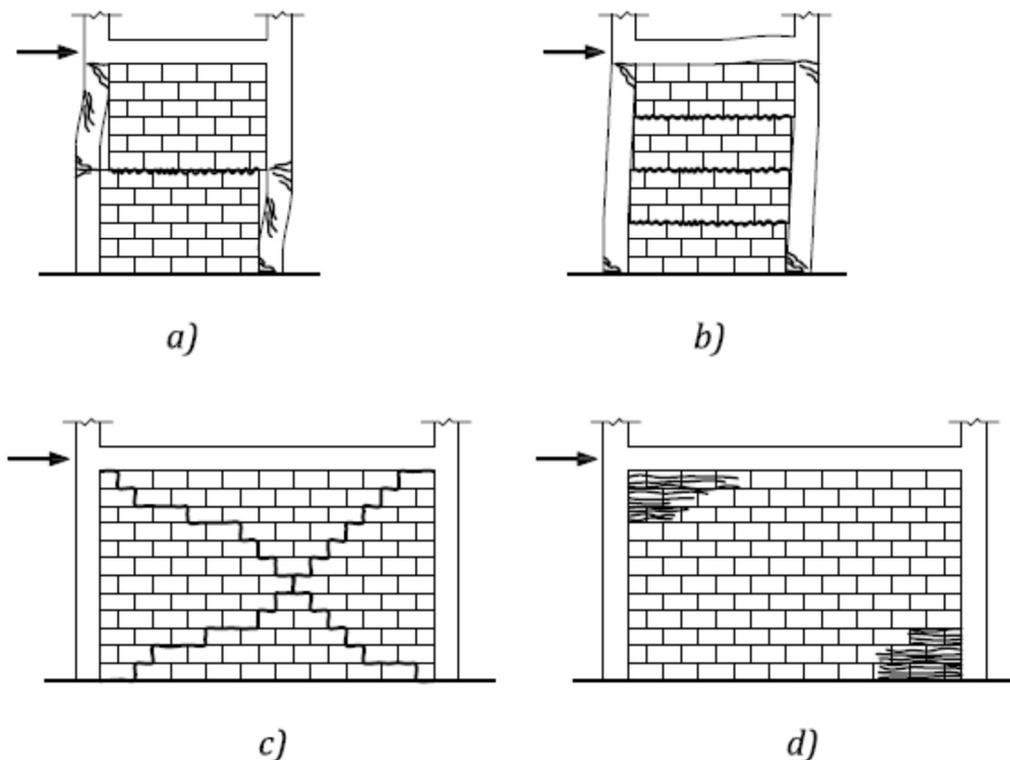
Masonry infill behaviour modes: a) and b) bed-joint sliding¹; c) diagonal tension²; d) corner compression².
